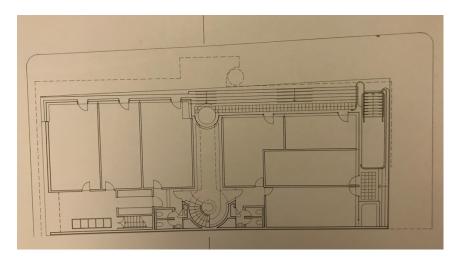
Ground floor plan. Drawn Ted Quinton 2006.
